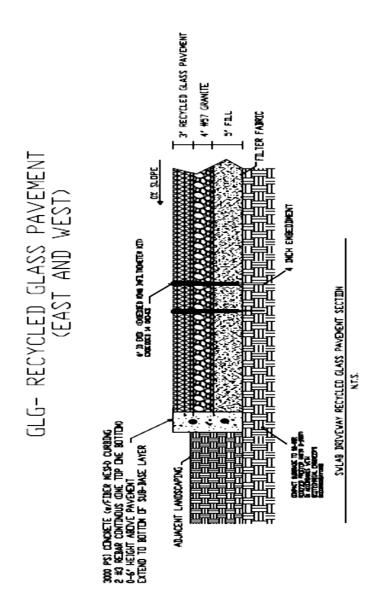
Cross-sectional view of Recycled glass pavement (Filterpave®)
